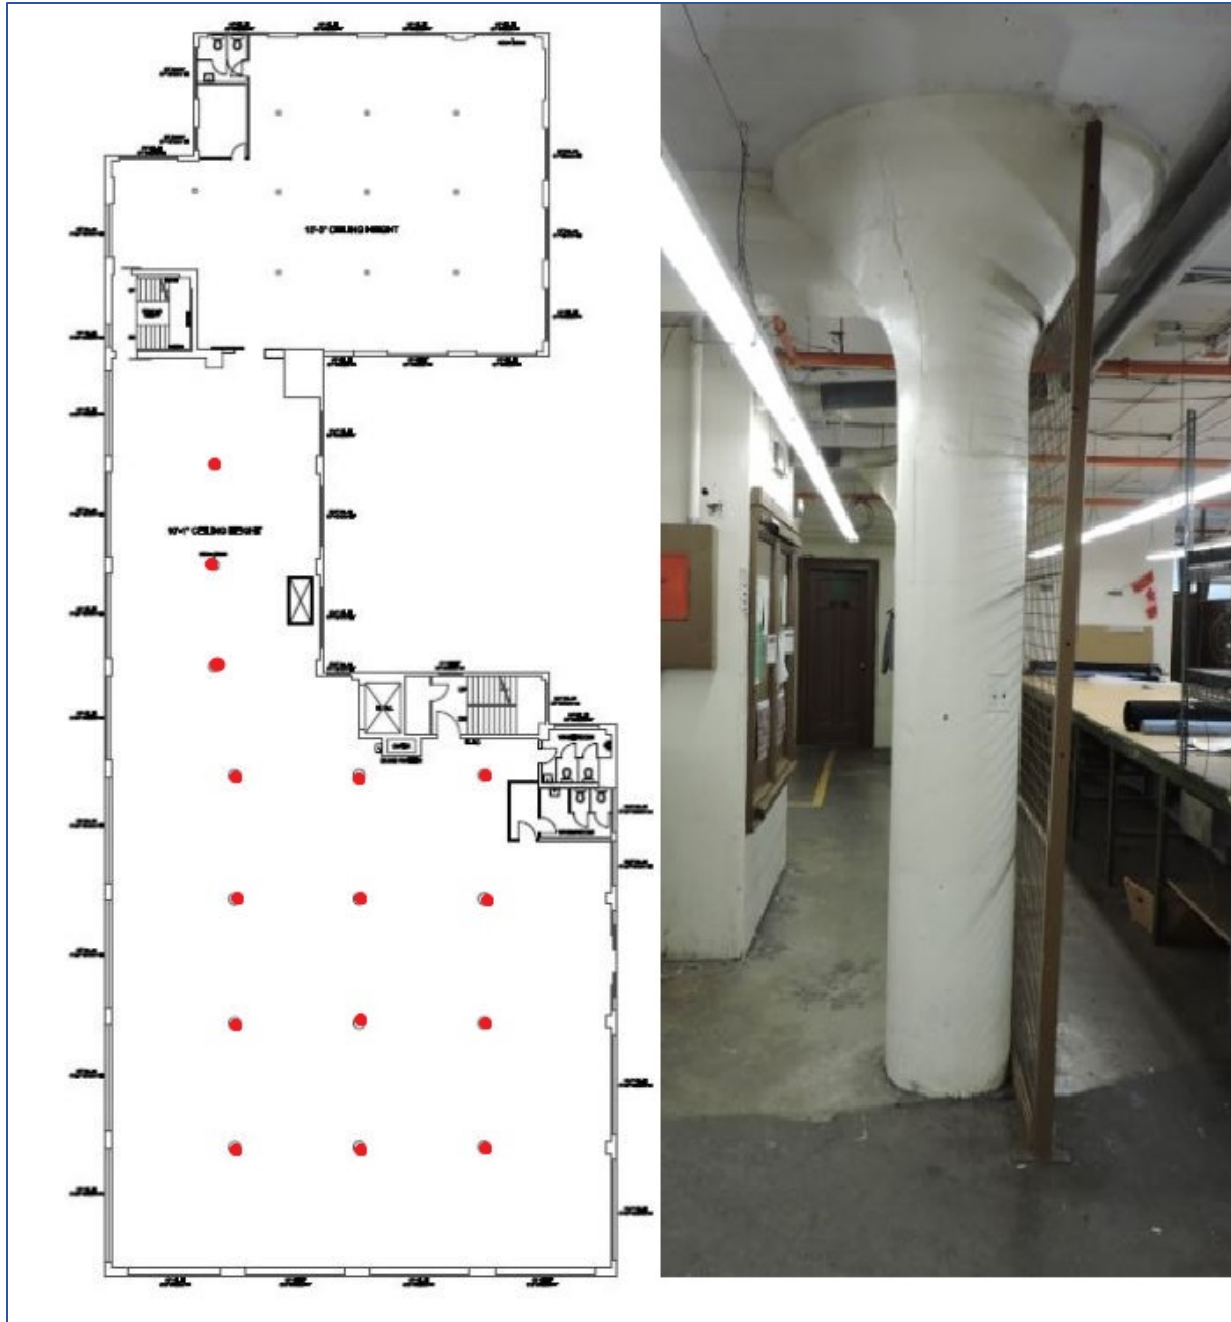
Second level plan with metal pillar locations marked in red (ZH, 2018).
